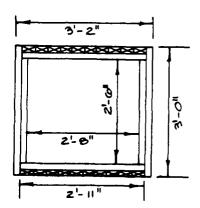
Typical Entryway to Buried Shelter With Culvert Shown.
